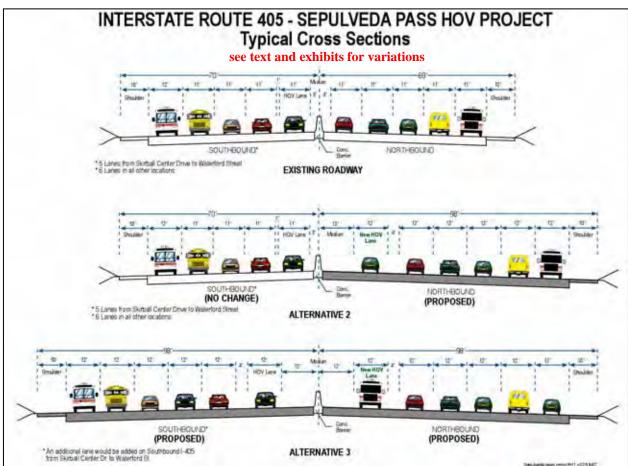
Conceptual Cross-Section of Build Alternatives
